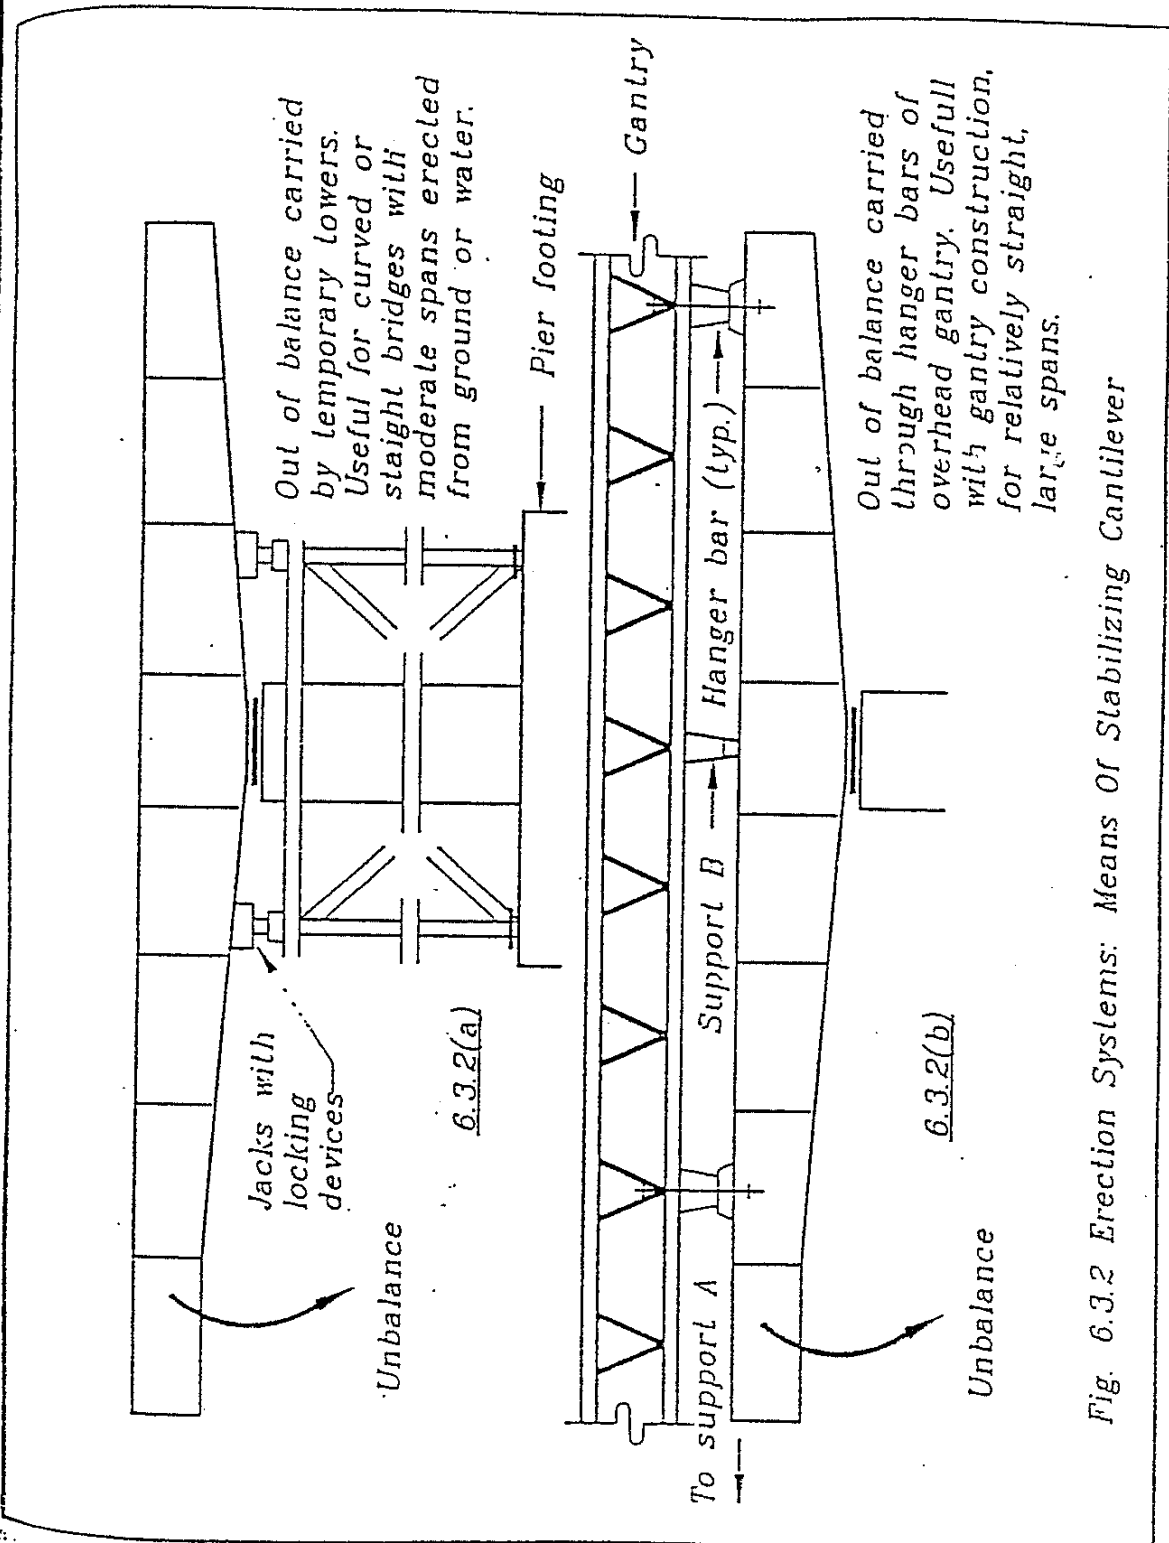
Erection Systems: Means Of Stabilizing Cantilever
